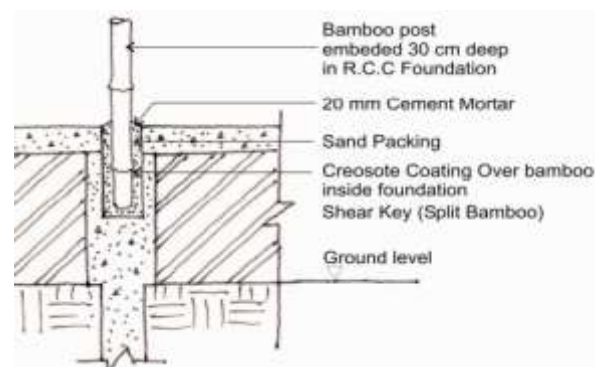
Foundation detail - Bamboo Construction (NID)
